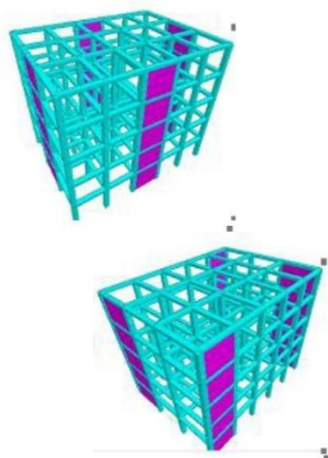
Frame 3) Shear walls at mid walls, Frame 4) Shear walls at corners [Source: (Sud, Shekhawat, & Dhiman, 2014).
